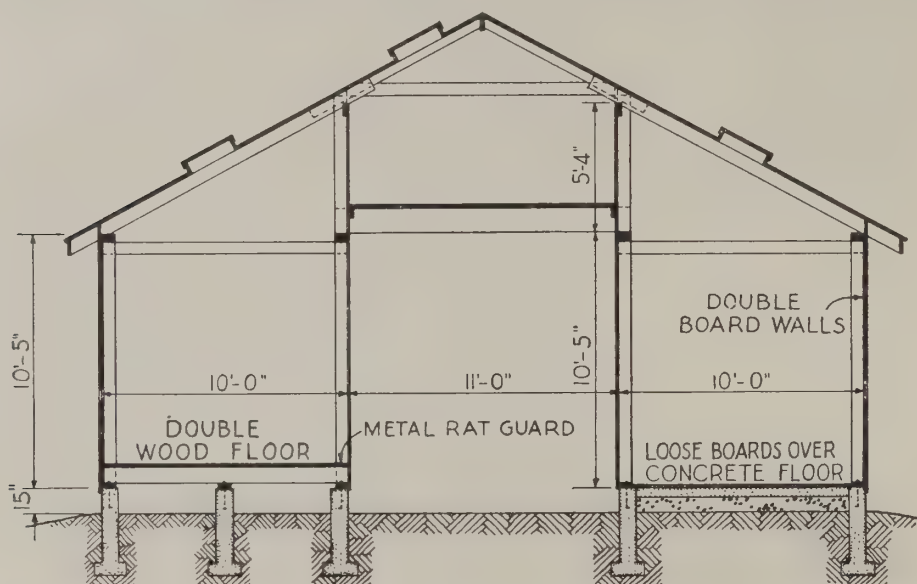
Cross section of granary design, showing both wood and concrete floors. For joist and stud sizes see tables 1 and 2. Note anchor bolts, studs lapping and spiked to wood joists, metal rat guards over sills of wood floor, and double-boarded walls with no inside lining. (For plan and perspective see fig. 13.)
